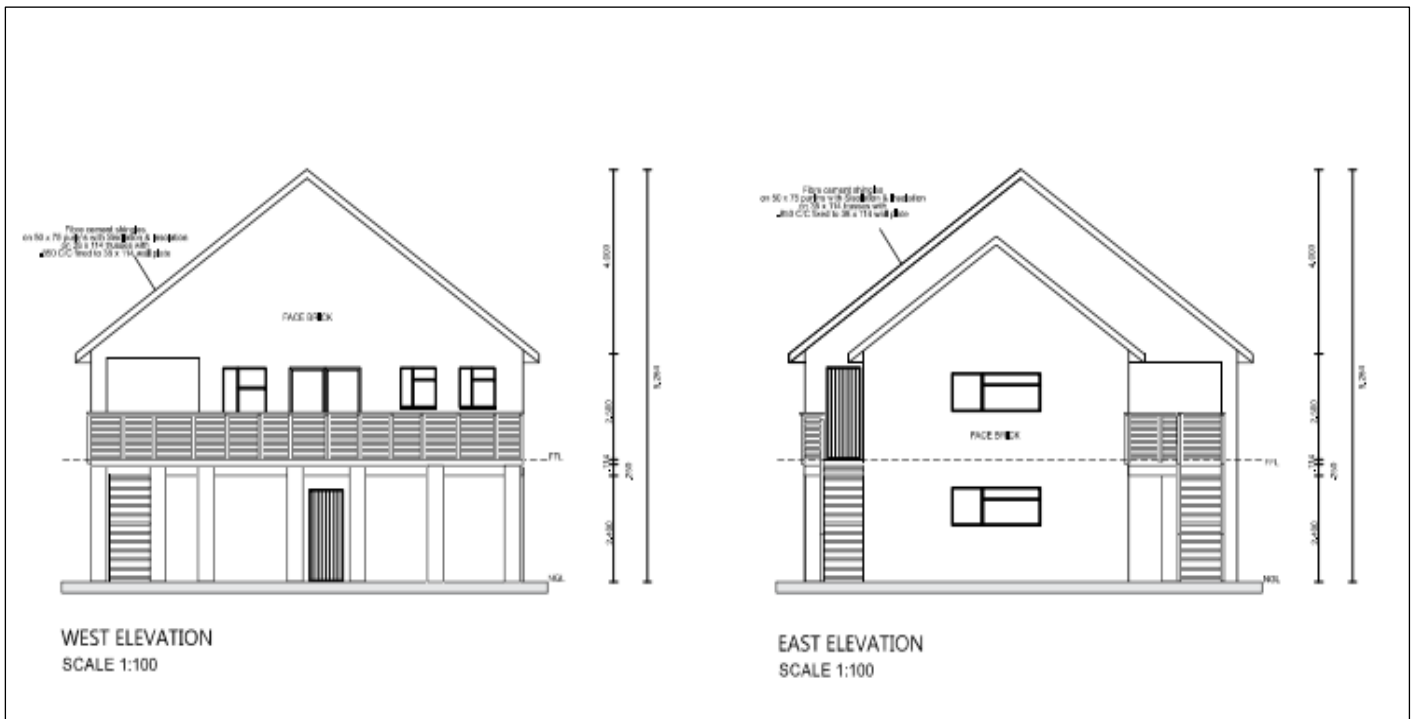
West and East Elevation of Proposed manager's accommodation units (Louv Designs, 2023)
